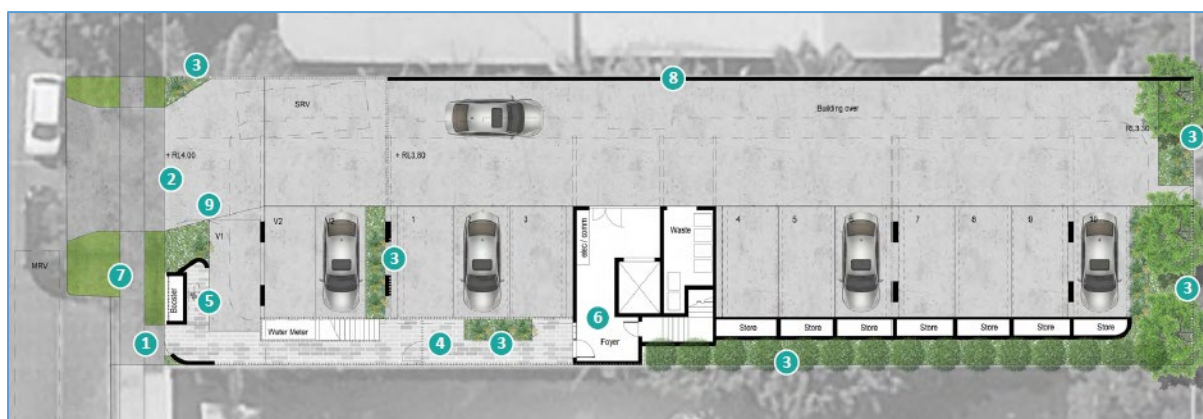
Proposed Landscape Concept Plan - Ground Floor (Shepherd)
